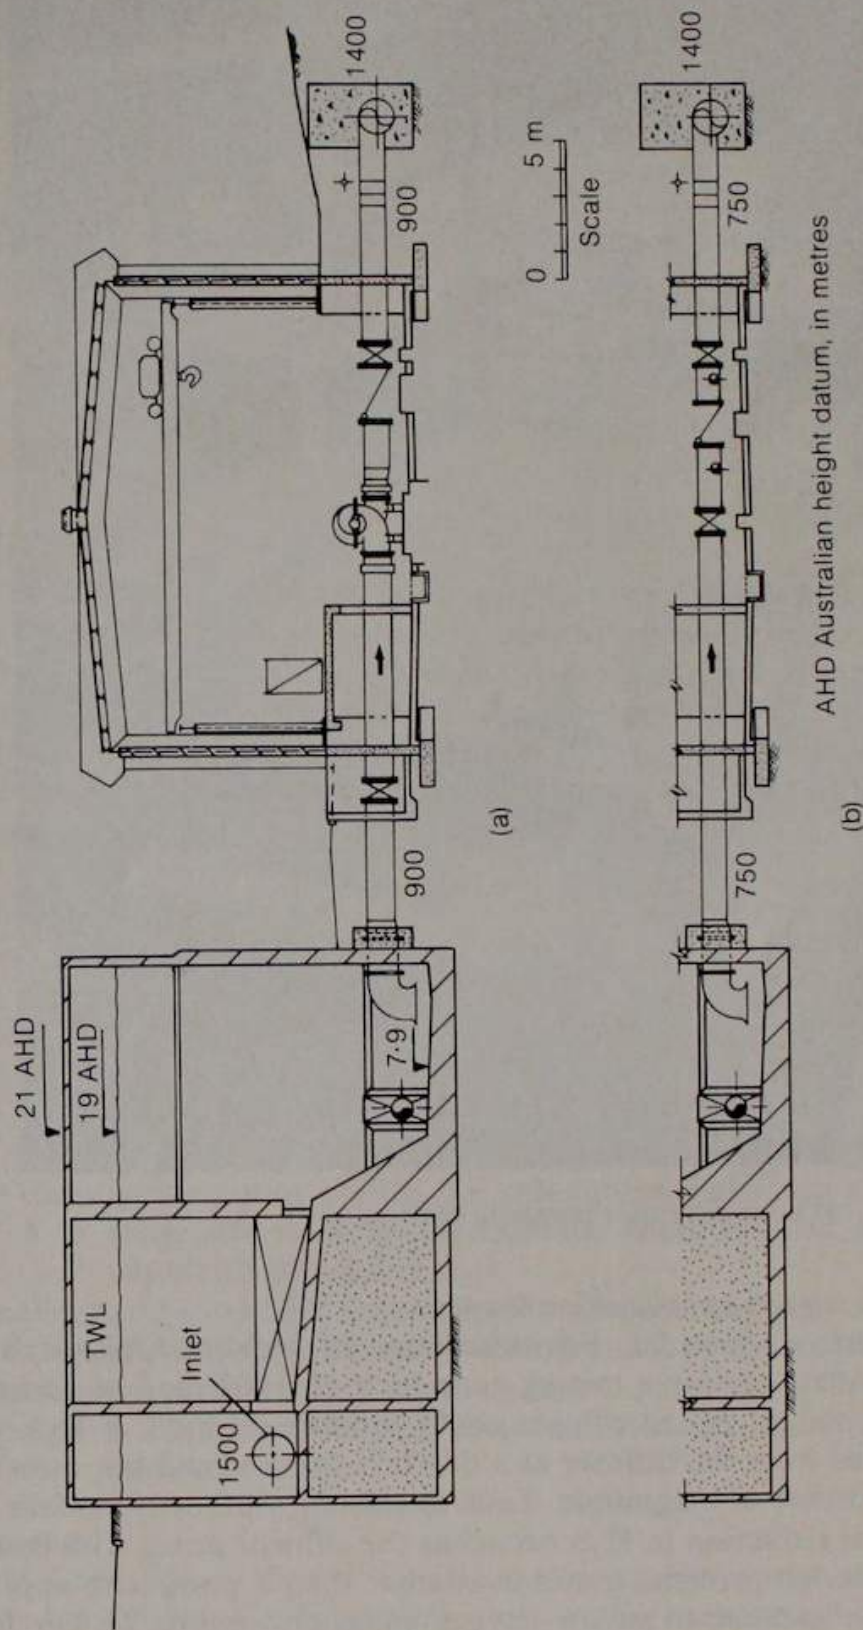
Woodman Point pumping station: typical cross-section through: (a) pump; (b) surge and gravity flow pipe (dimensions in millimetres)
